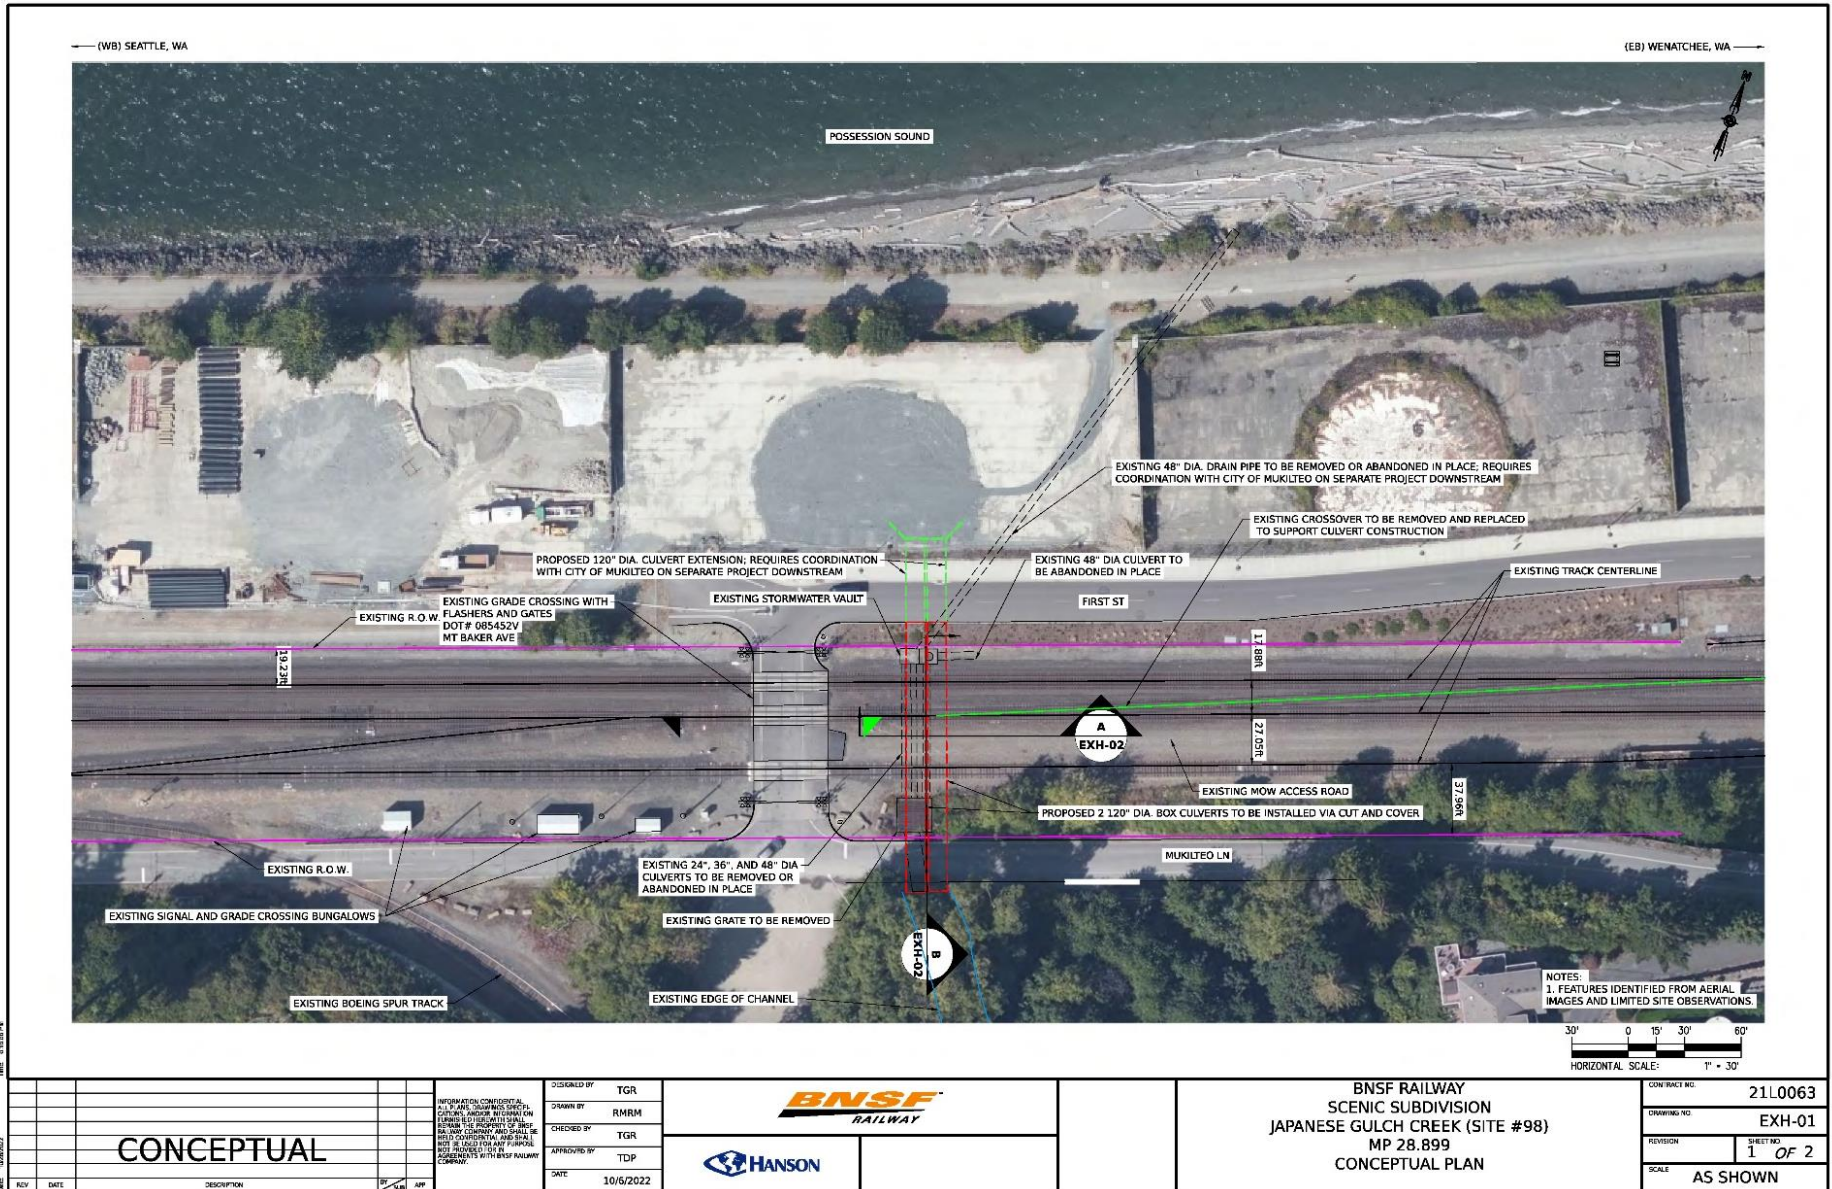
Conceptual Engineering Plan View of Replacement Culverts Under Railroad Tracks at Japanese Gulch Creek
